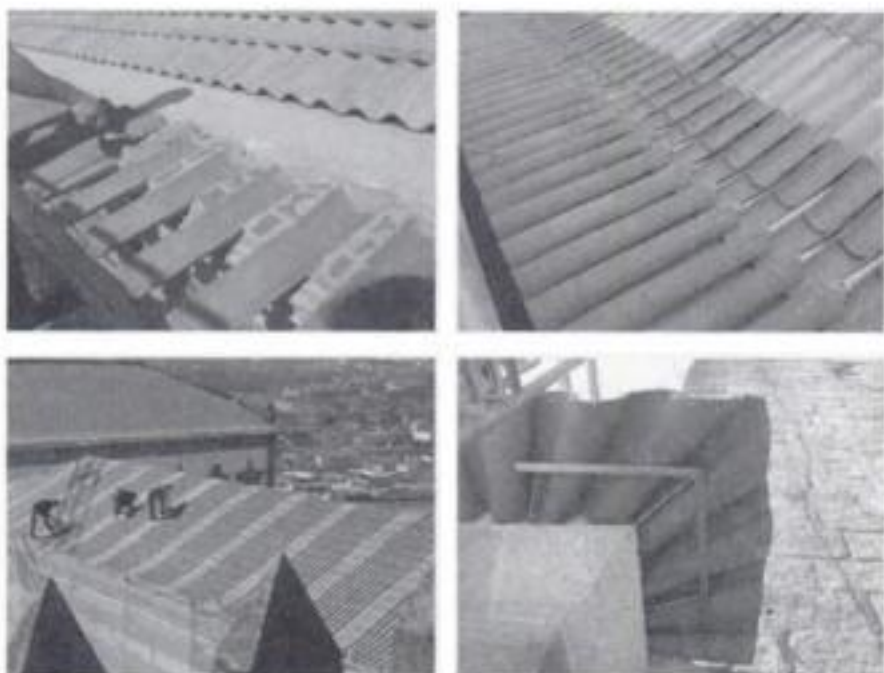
Replacement of the ceramic tiles including new anchors, traditional eaves, strengthening in the corners, introduction of under-roof sheeting and walkways.
